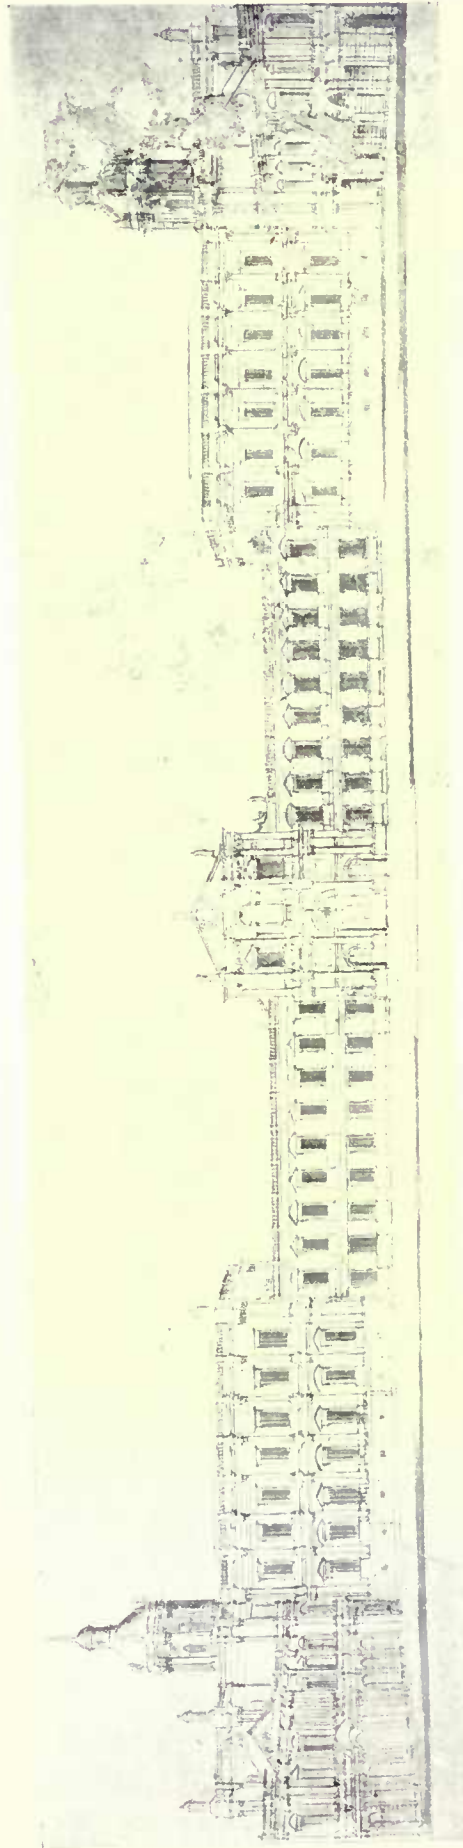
WEST ELEVATION OF THE PLAN SHOWN BY FIG. 14
